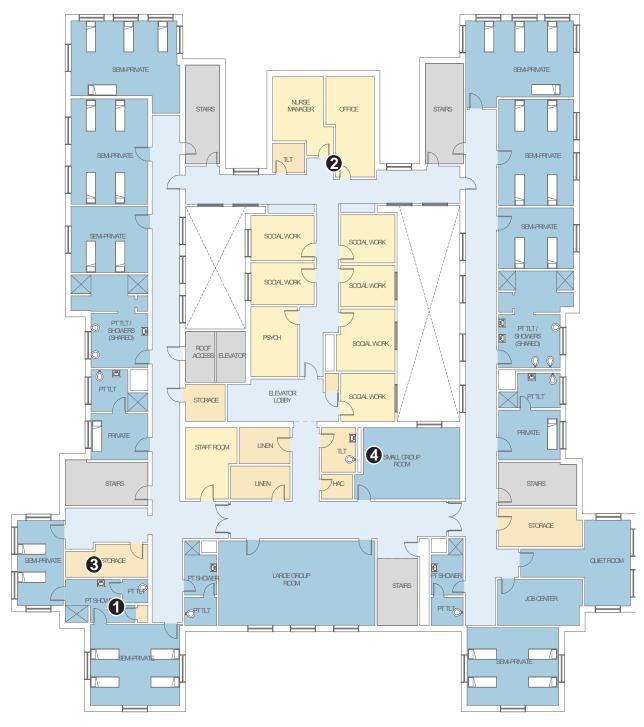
VAMC American Lake Domiciliary, Floor Plan
